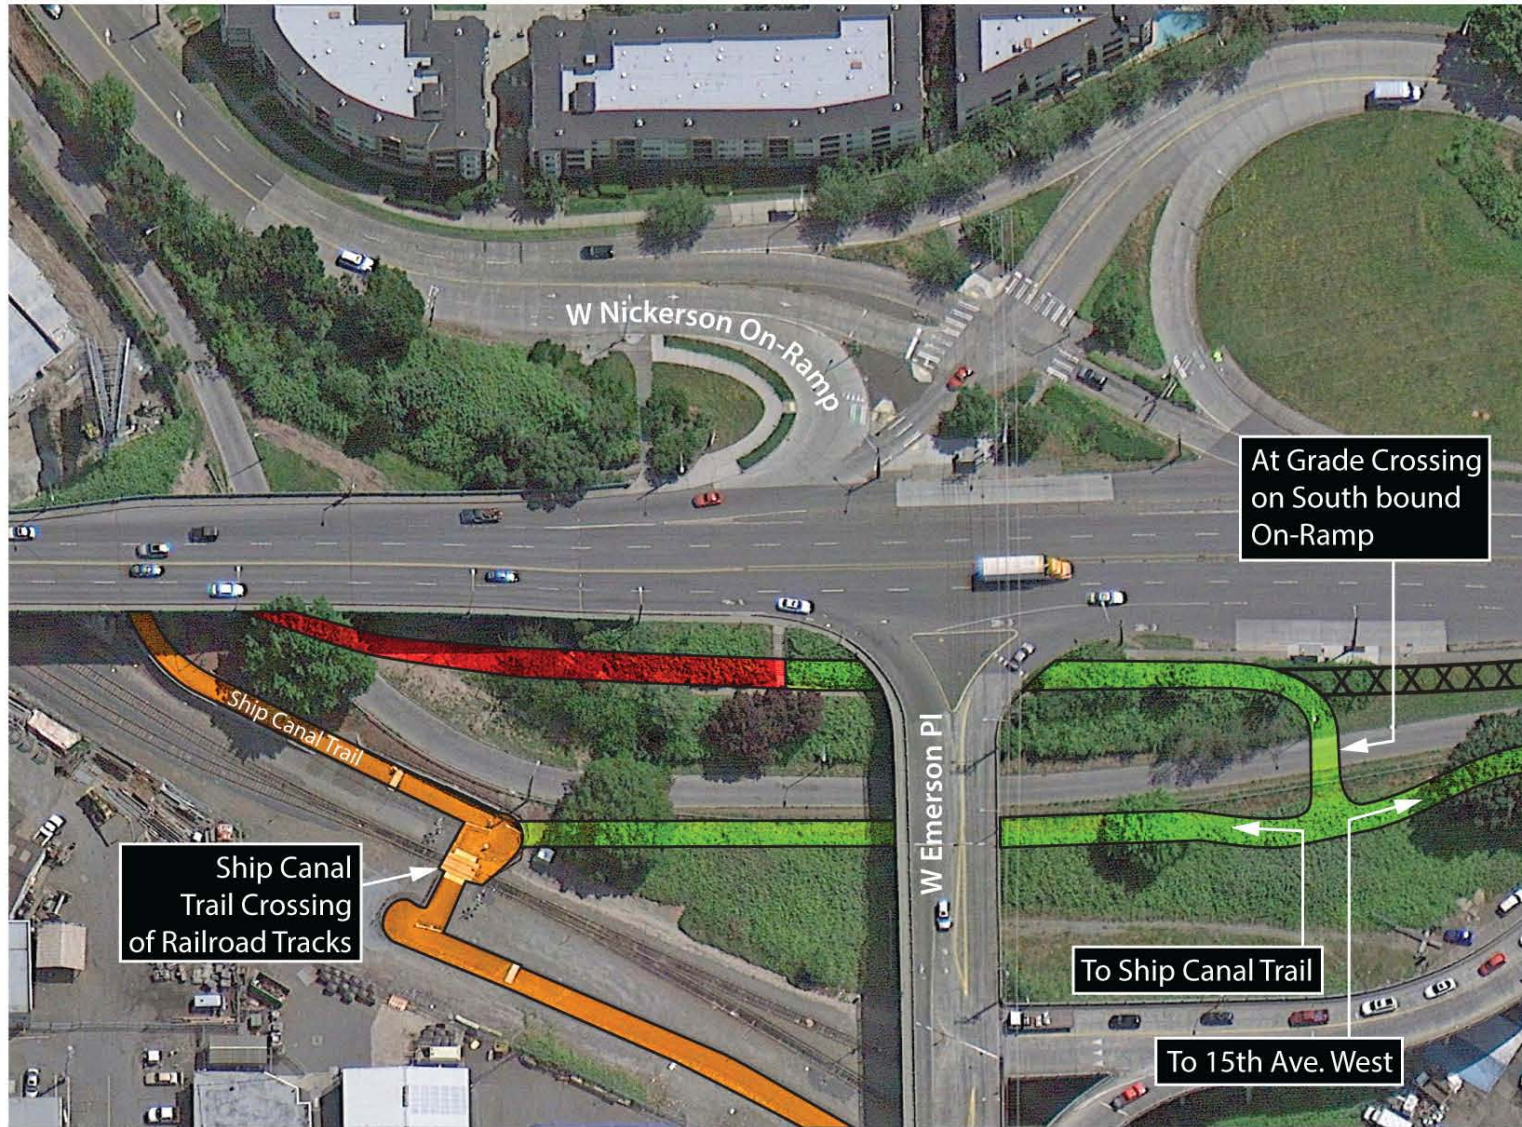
Original Emerson Underpass Trail Concept Drawing as Proposed by SDOT and Modified by BergerABAM
